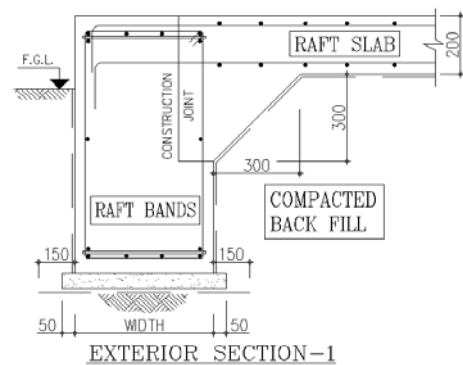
A typical Section of Semi-Rigid Raft Foundation
